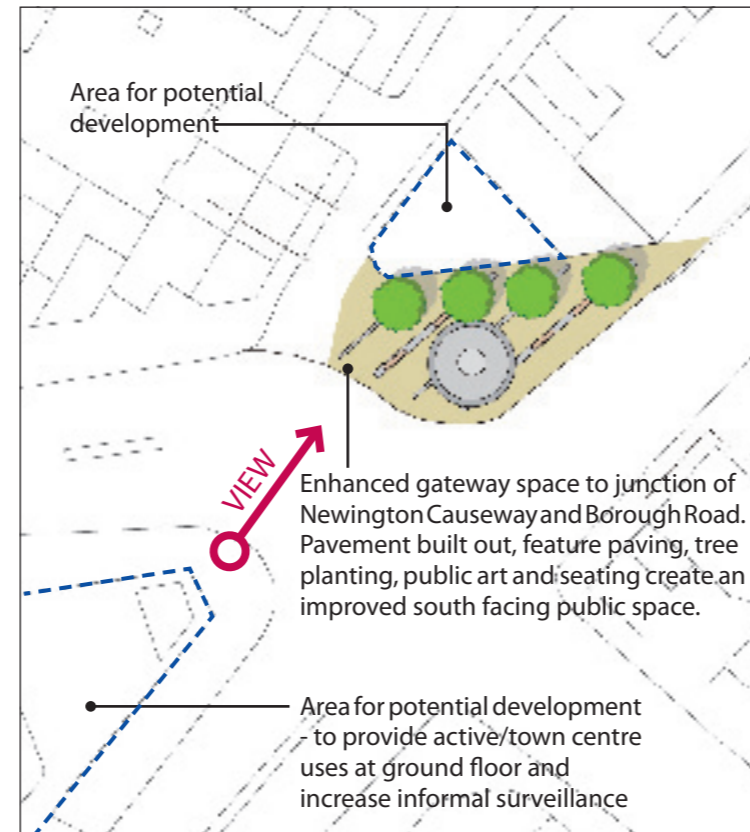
Illustrative plan of Newington Causeway Gateway
